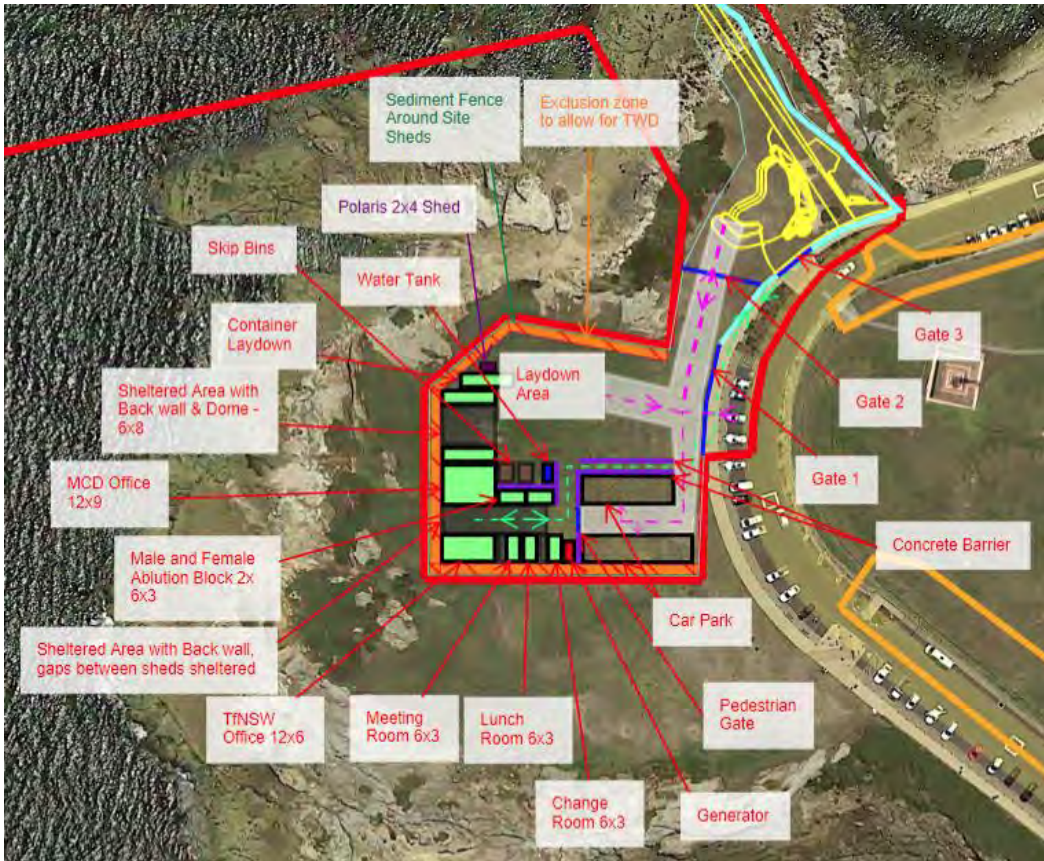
1 Temporary Car Parking Arrangement at La Perouse
